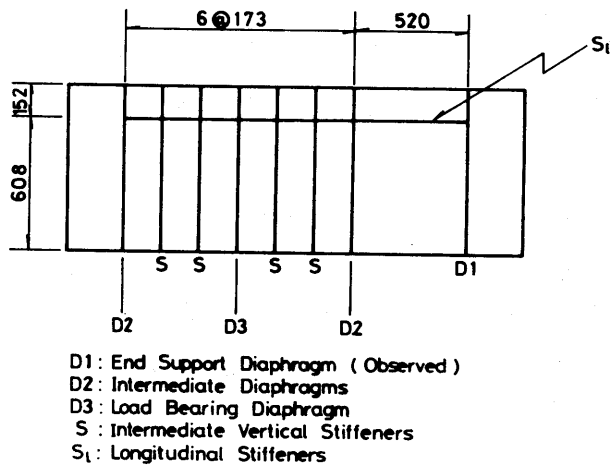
WEB PANELS OF TEST GIRDERS (B SERIES)
